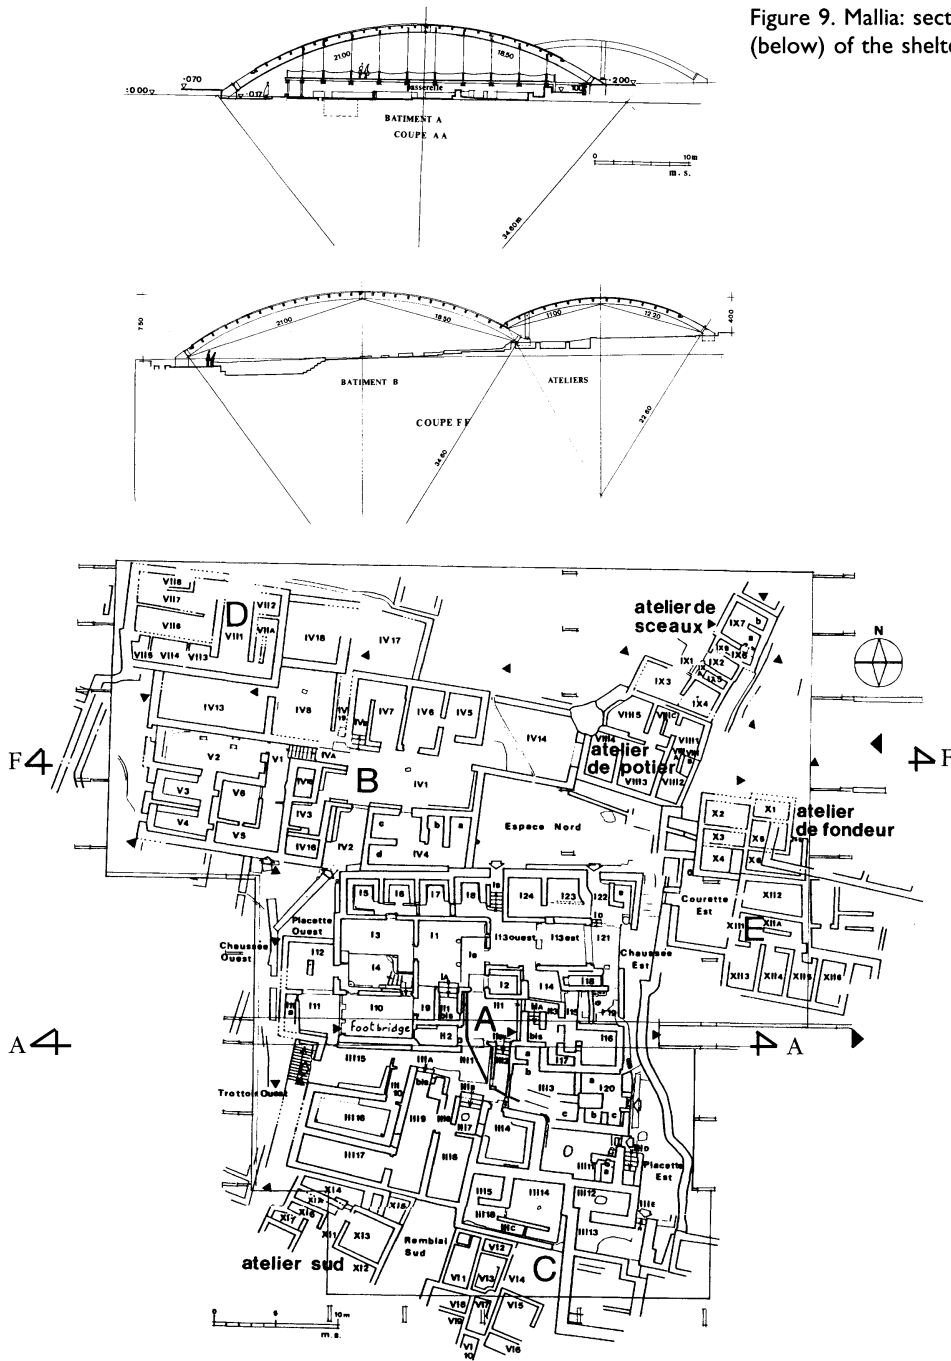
Mallia: sections (above) and plan (below) of the shelter covering quarter M.
